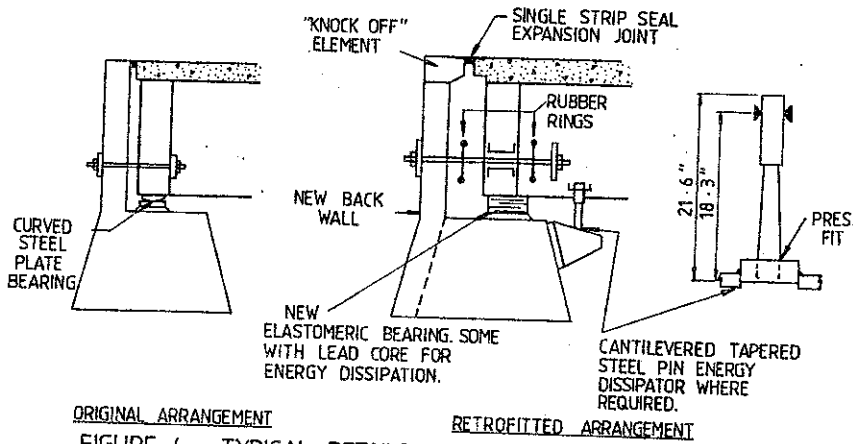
TYPICAL DETAILS AT ABUTMENTS
